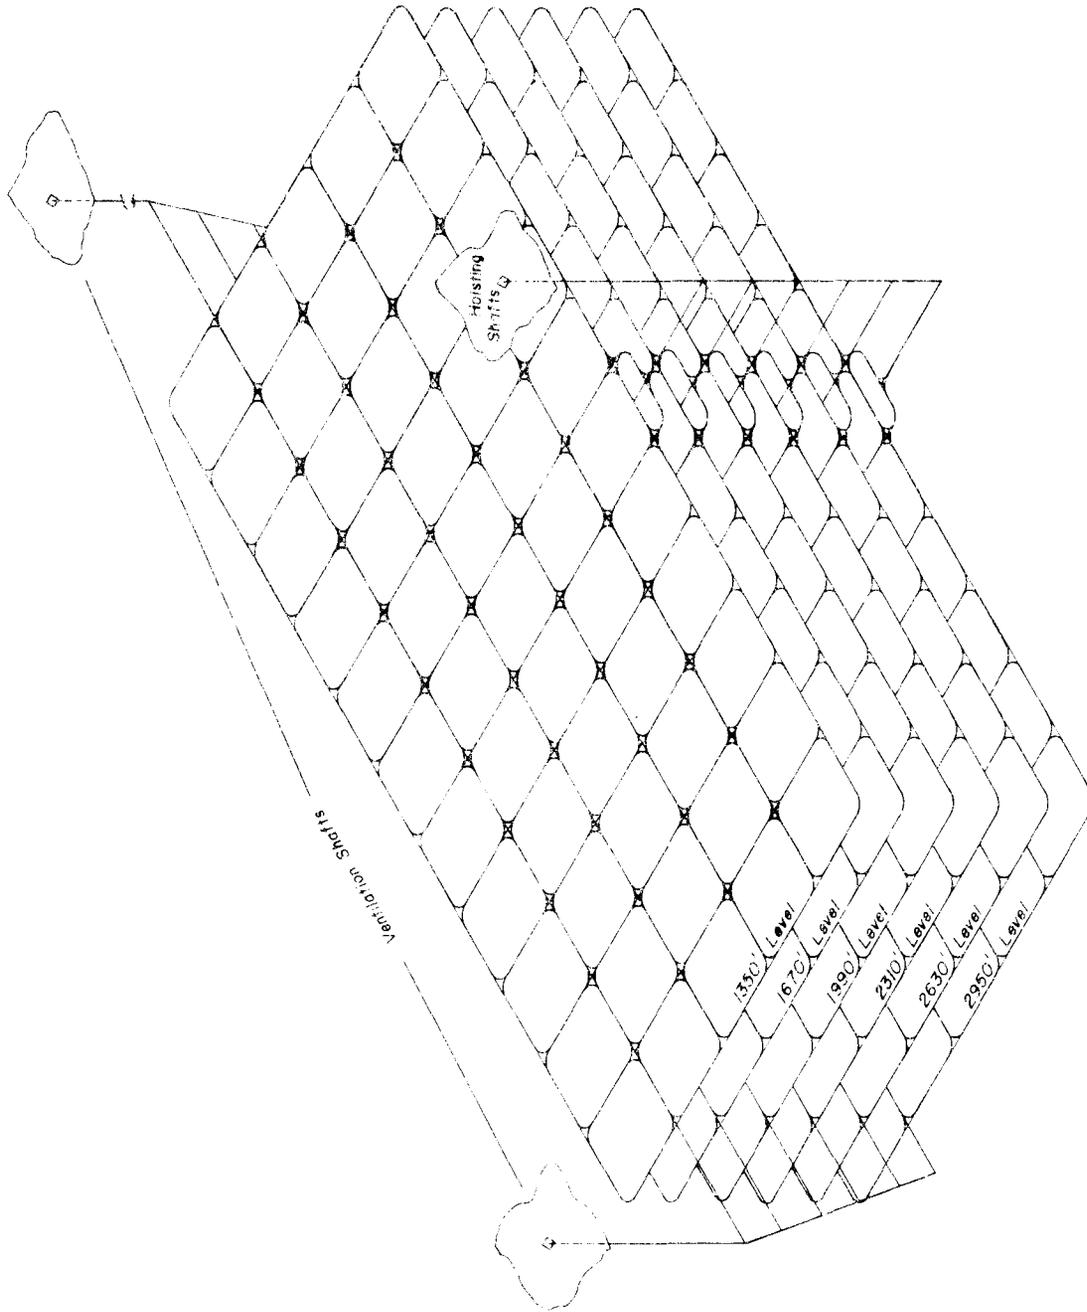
Multilevel Layout, Sublevel Stopping with Full Subsidence
